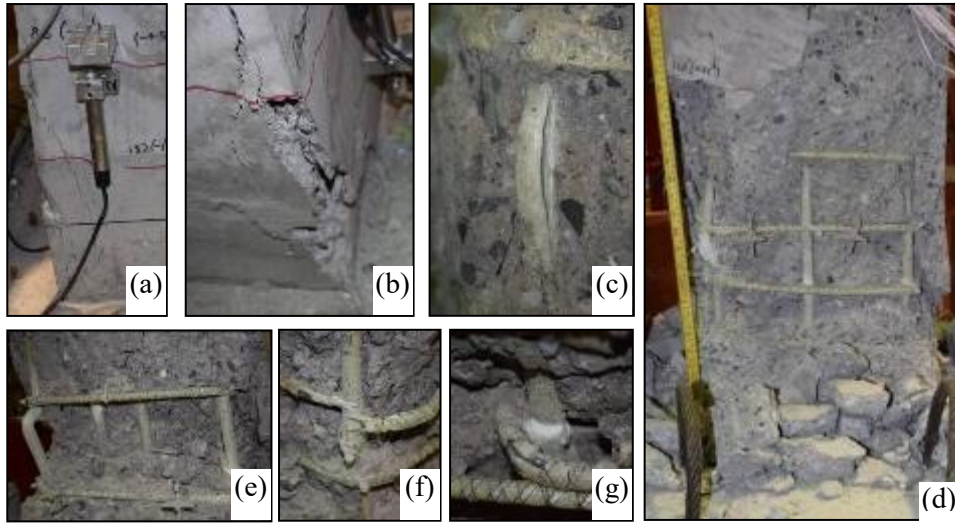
Typical failure progression of the GFRP-reinforced columns: (a) vertical splitting; (b) spalling of concrete cover; (c) longitudinal-bar interlaminar degradation; (d) concrete crushing causing failure; (e) fracture of longitudinal bars; (f) rupture of GFRP rectilinear spirals; and (g) rupture of GFRP cross ties.
